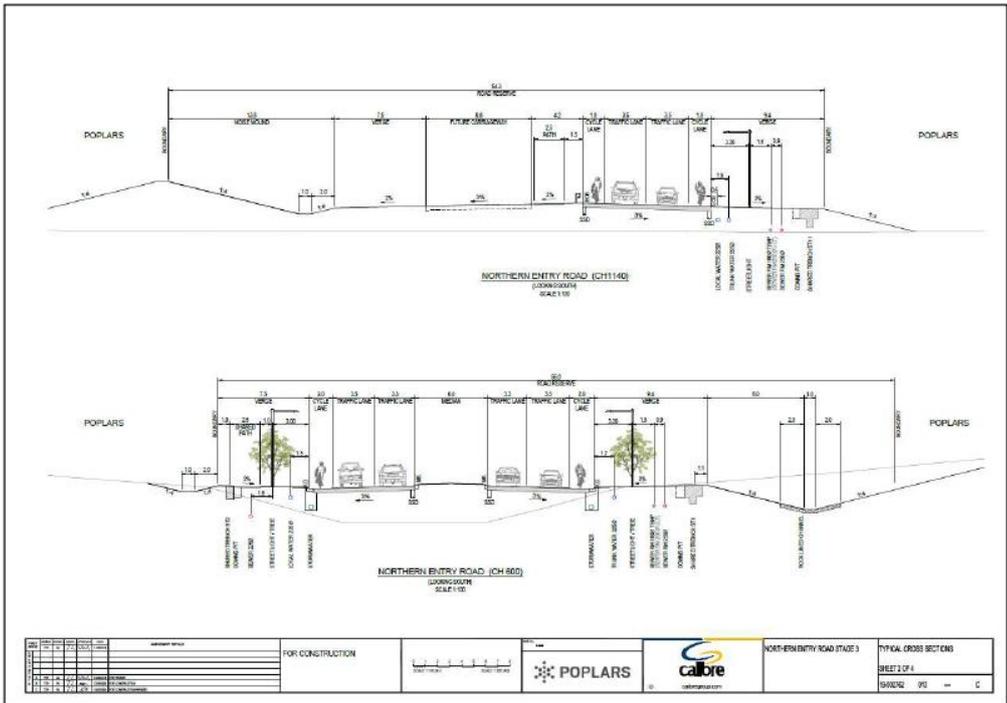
Latest Approved Road Cross Section – Envirova Road north
